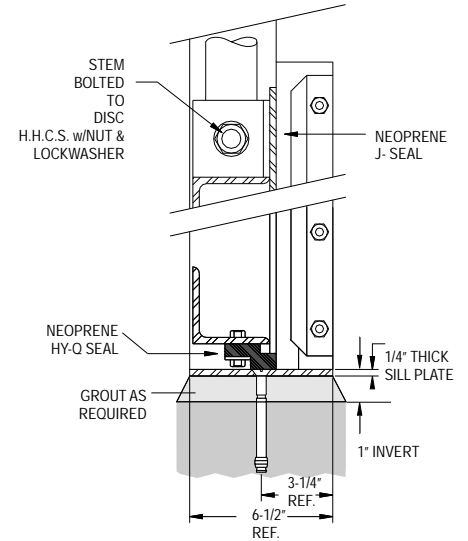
763- Stainless Steel Surface Mounting; Section BB
